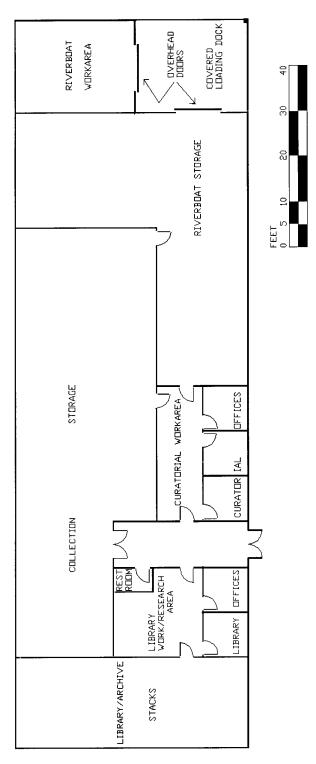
Sample General Floor Plan of a Museum Collection and Library
